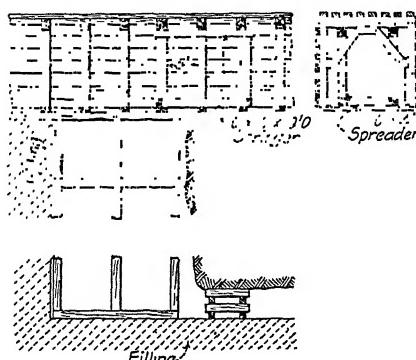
METHOD OF SUPPORTING DRIFT TIMBERS WHEN BEING UNDERMINED BY STOPING.
